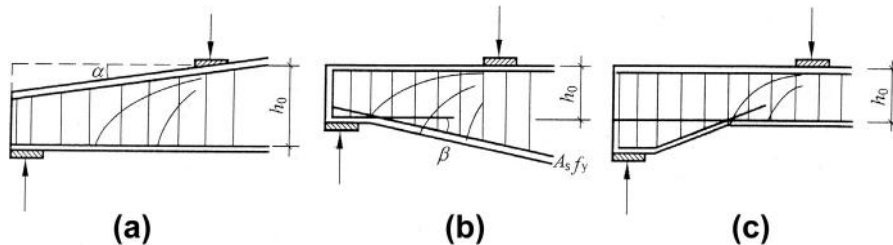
Beams with variable section: (a) inclined top surface, (b) inclined bottom surface, (c) haunched beam
